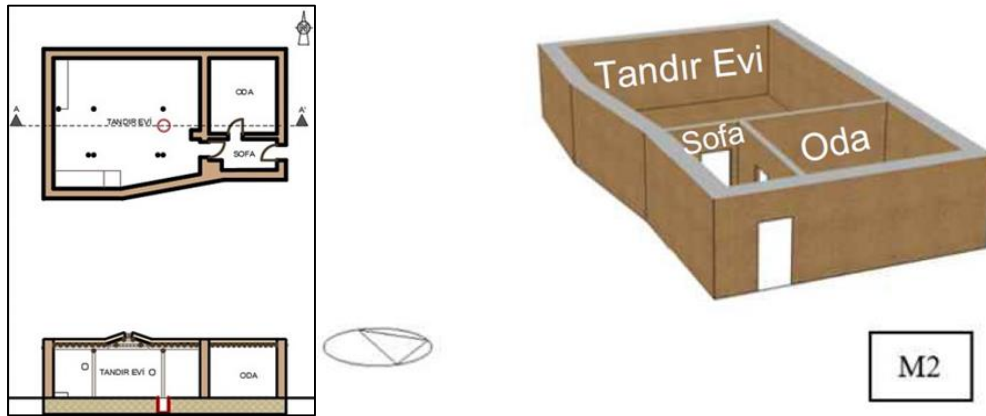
Plan, section and 3D model of the adobe house studied (Şeker Archive).
